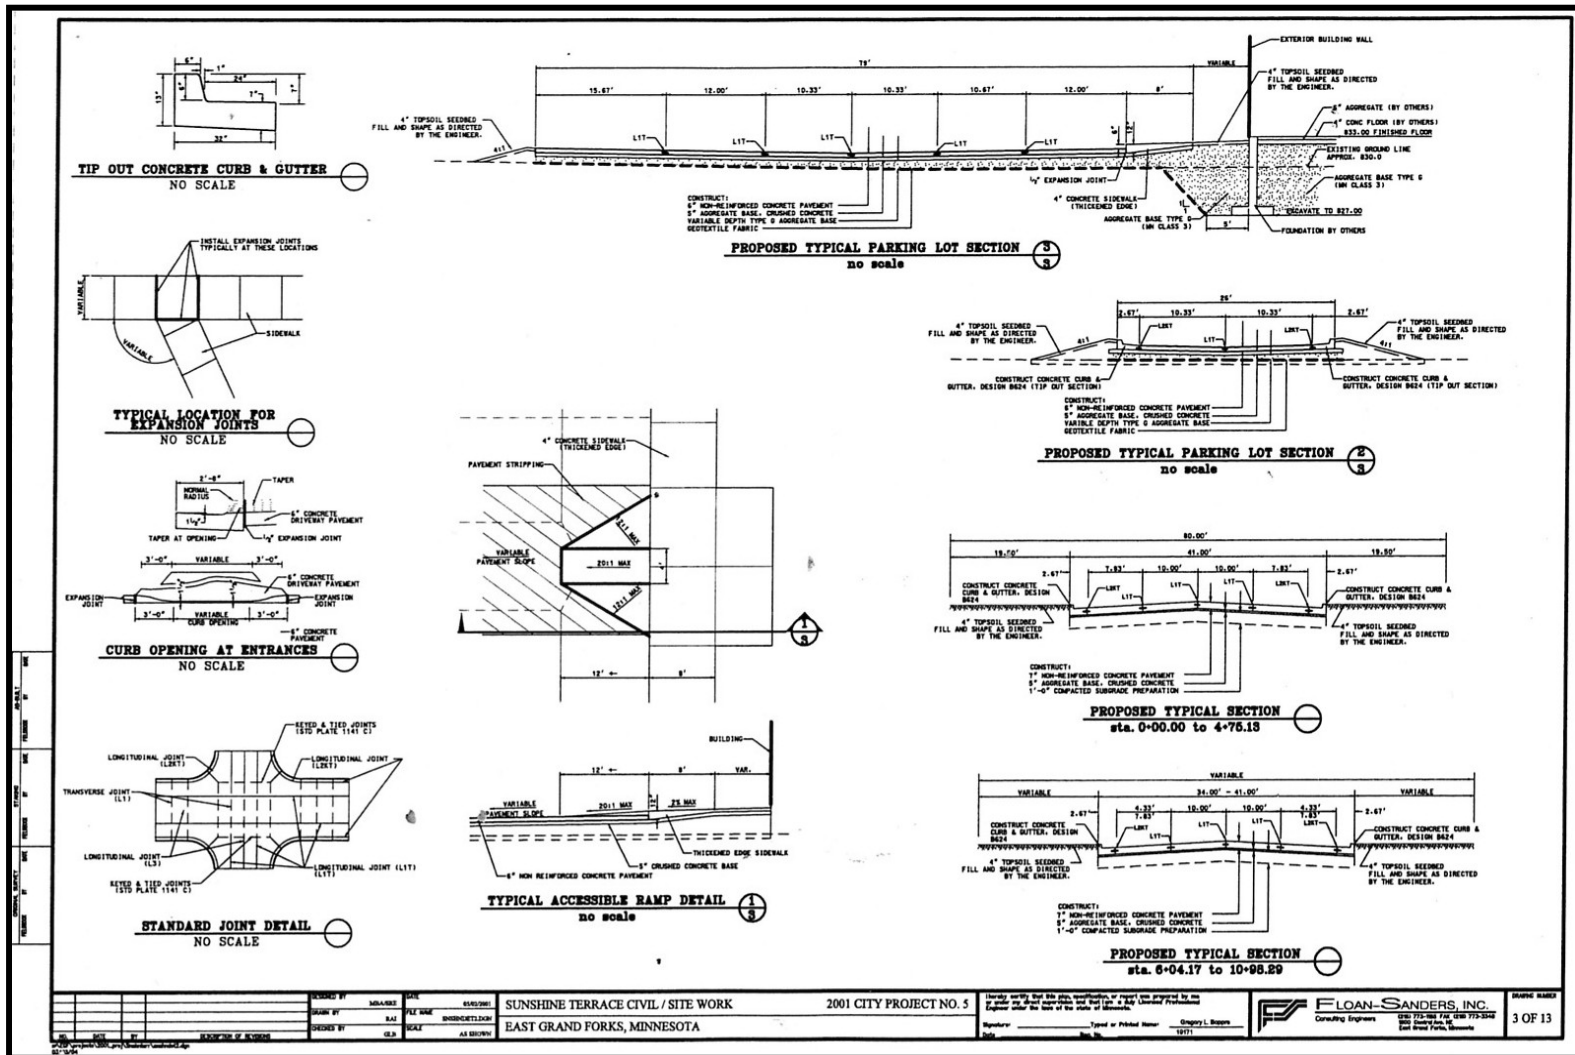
Typical PCC pavement construction plan for the City of E. Grand Forks.
